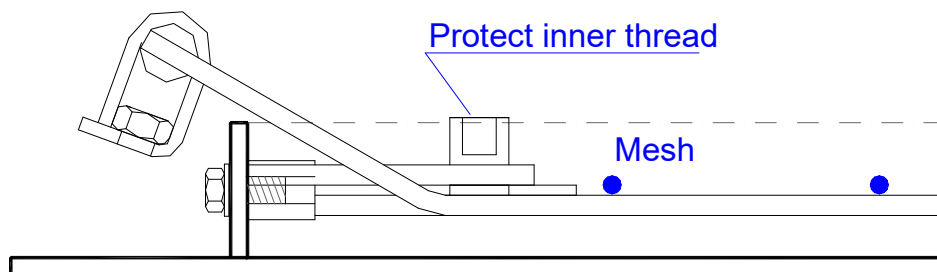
Fixing ARR suspension anchor to horizontal formwork.
